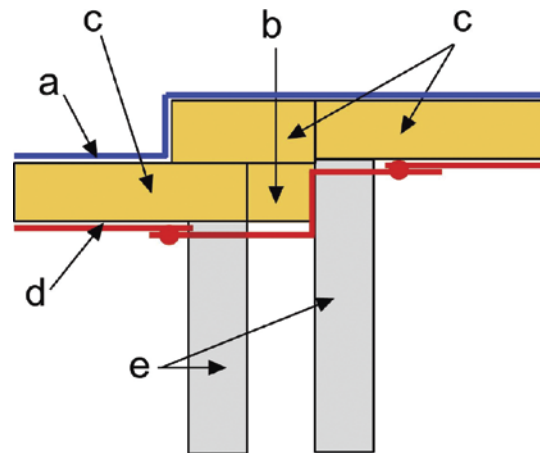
a) weather barrier, b) site insulation, c) insulated roof cassette, d) air barrier, e) party wall.
